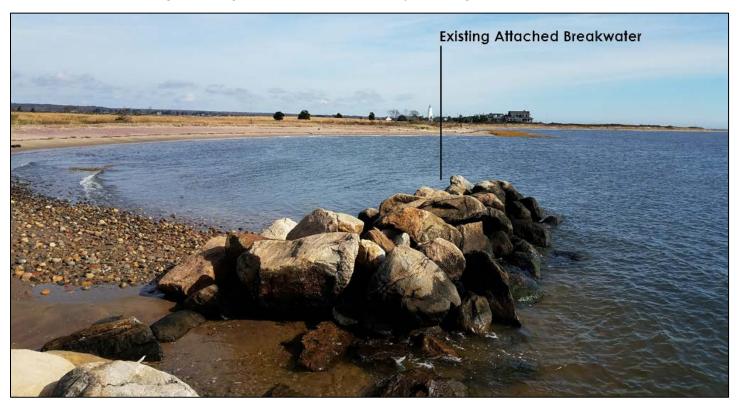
Existing attached breakwater at west end of site (looking northeast at mid-tide)
